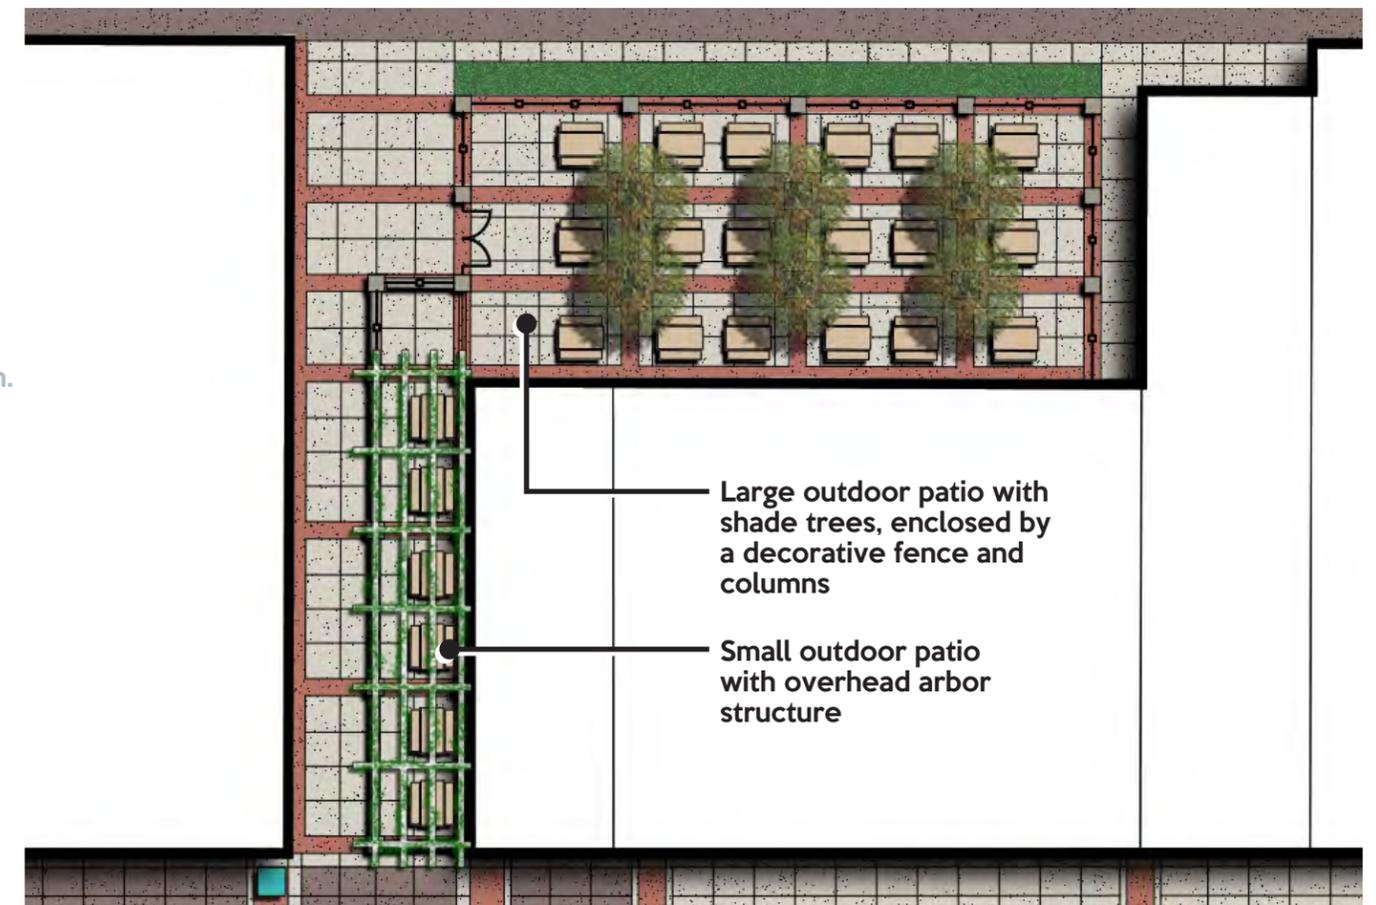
CAMPBELL PLAZA CONCEPT PLAN VIEW
